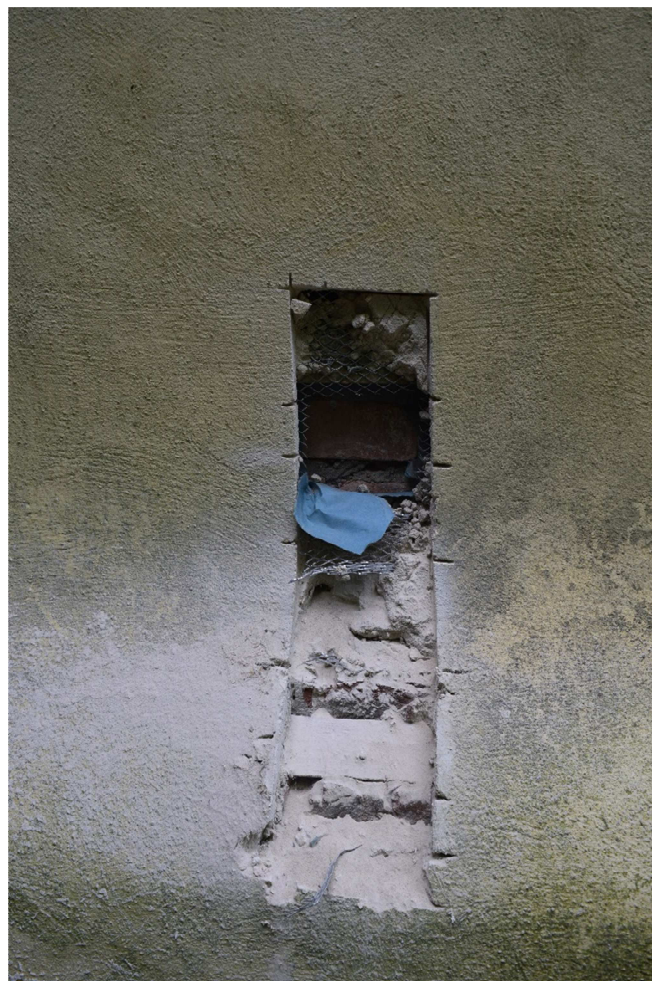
External view of the modern Fletton brickwork in the north-west gable end wall.
